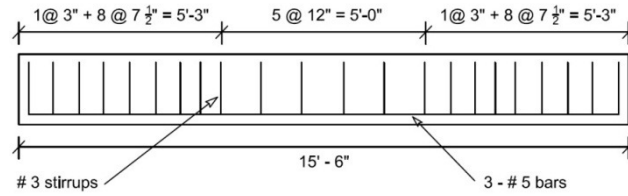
Reinforcing details for tested beam, Buckhouse (1977)
